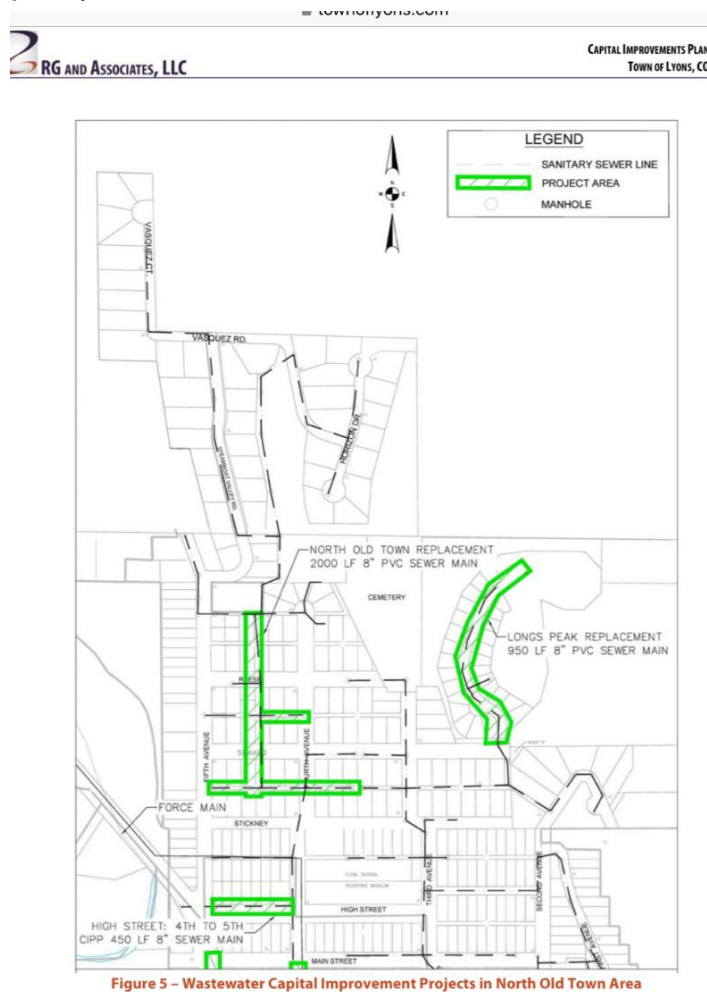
Wastewater Capital Improvement Projects in North Old Town Area
